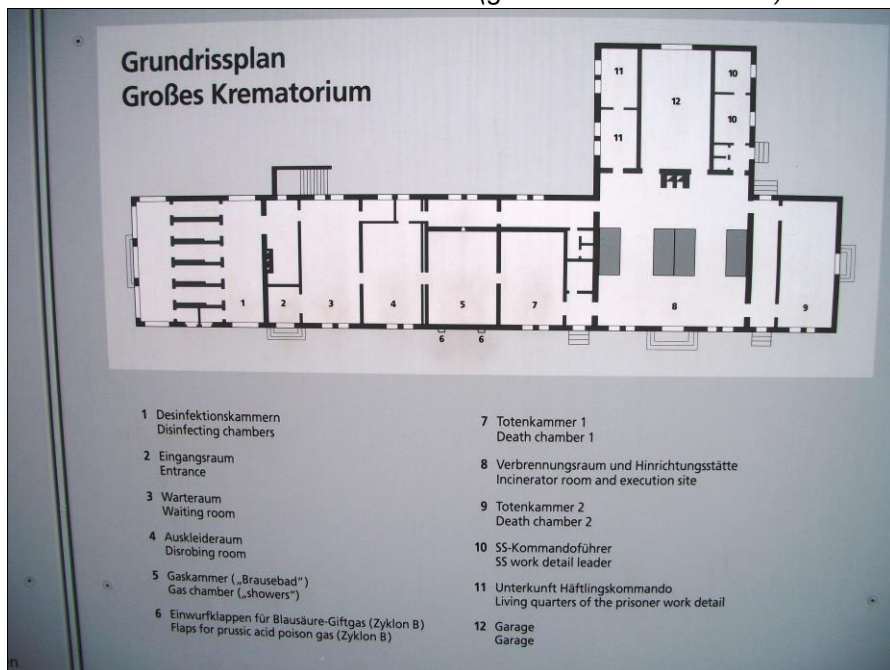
Crematorium floor plan (room 5 = gas chamber).
